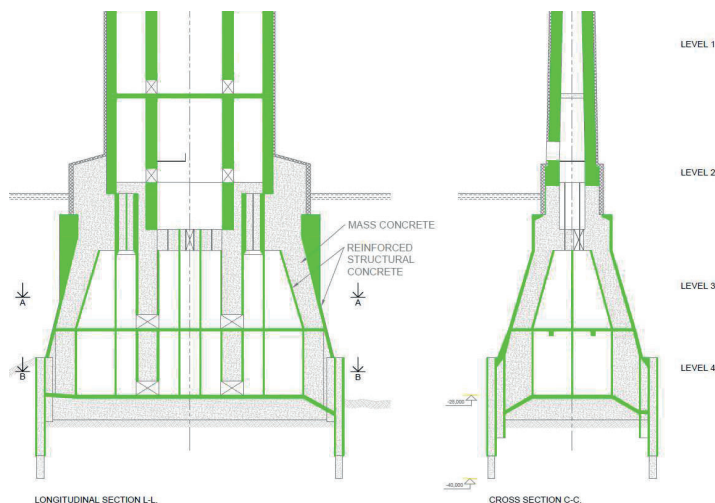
Vertical sections of the piers. The reinforced concrete is highlighted in green signature, and the mass concrete are marked in grey. The inner parts of the piers are hollow, thus making it possible to inspect the internal sections of the piers from top to bottom.
